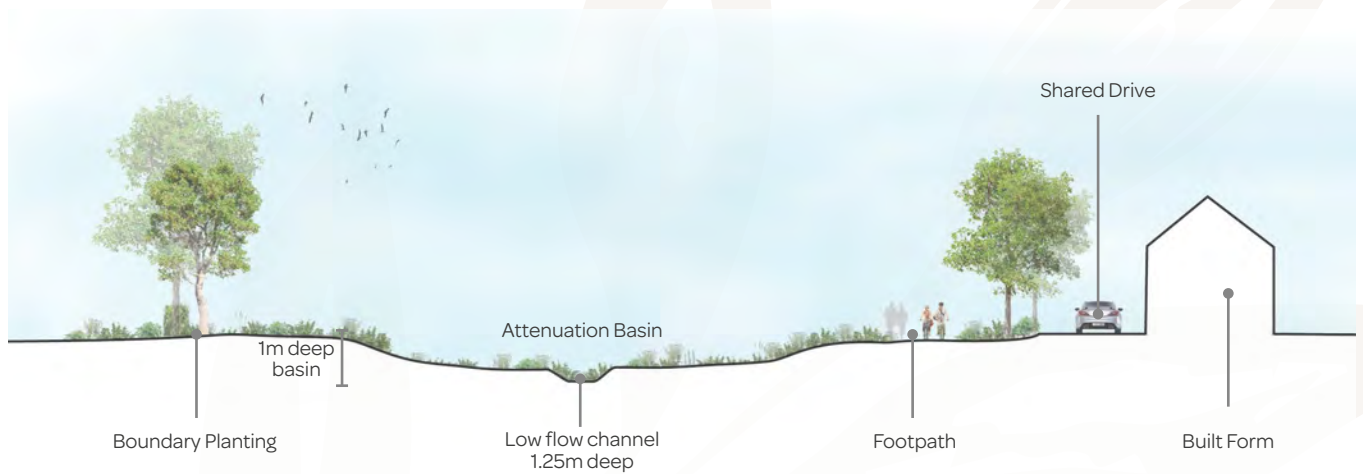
Illustrative Cross Section of Attenuation Features within Open Space
